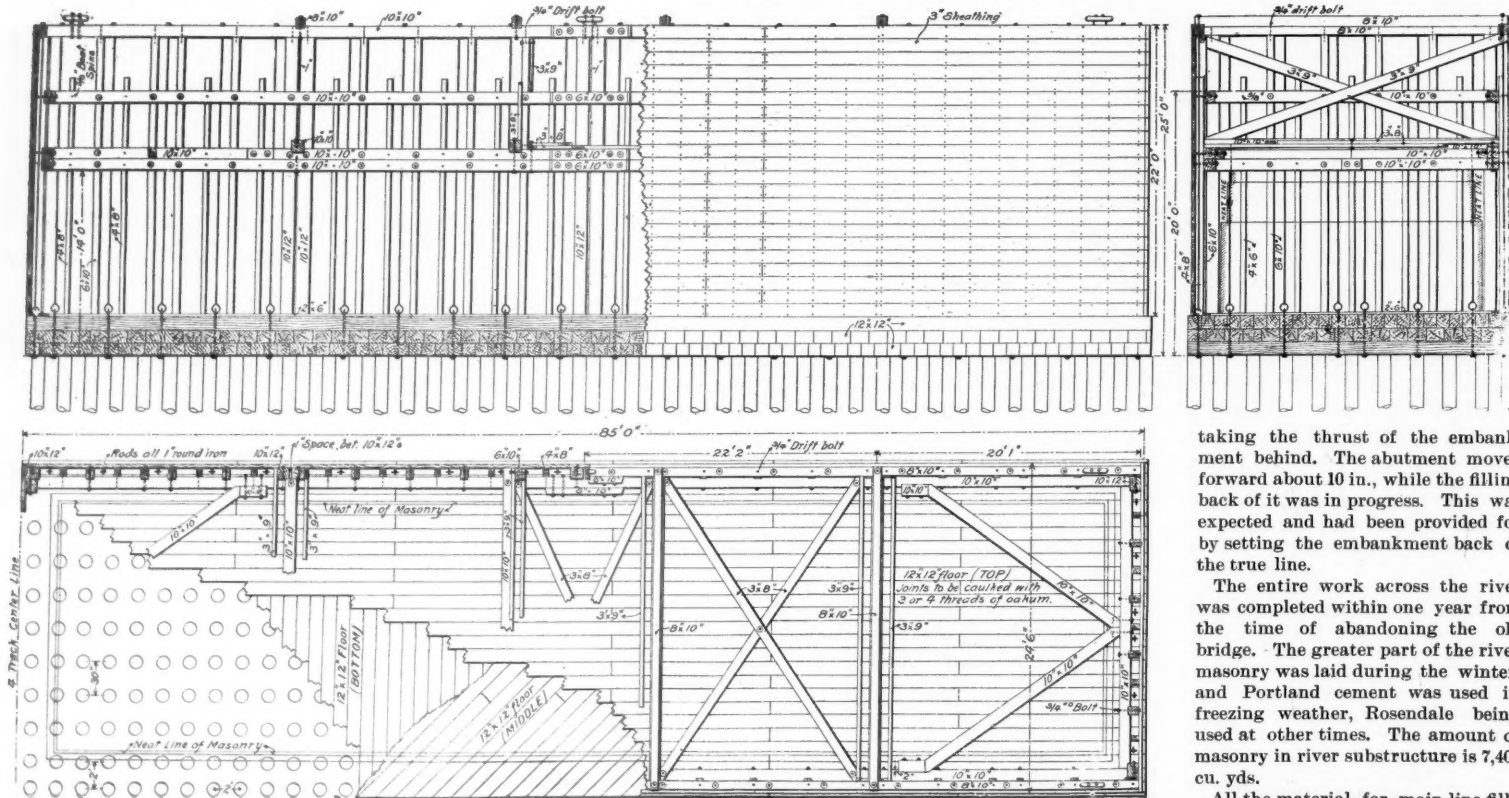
Caisson for the East Abutment—Norwalk Bridge.
